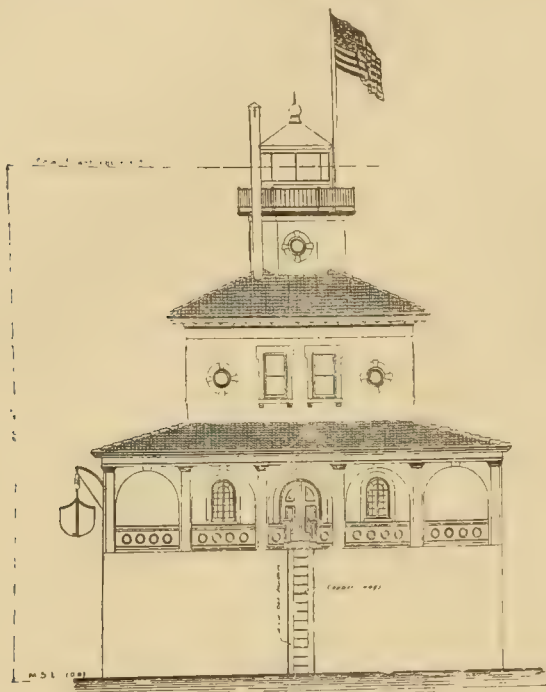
SOUTHEAST ELEVATION OF STATION.
